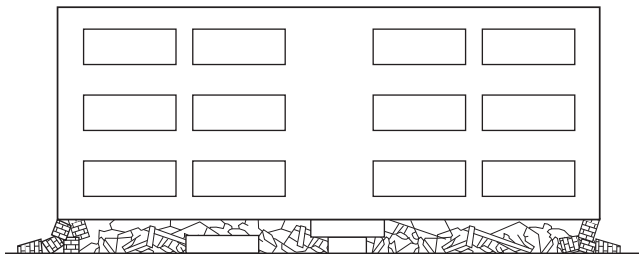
(f) Soft First Story Collapse Pattern — Heavy Floor Construction.
